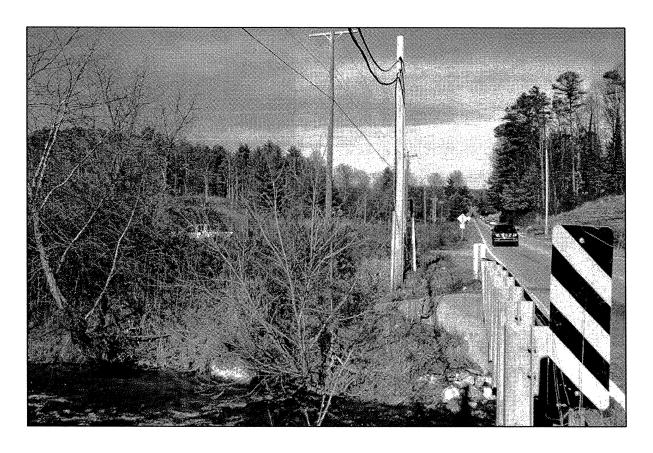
PHOTO TAKEN STANDING NEAR B1-B LOOKING UPSTATION TOWARD BENT 2.
